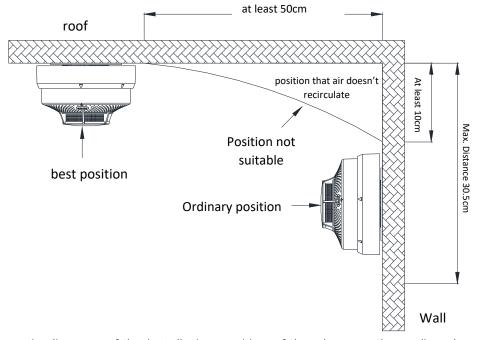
Schematic diagram of the installation position of the alarm on the wall and roof of the flatroofed room
